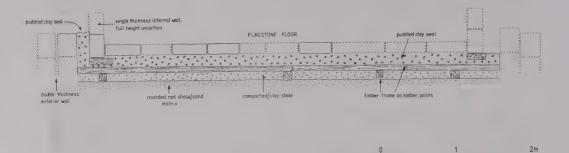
Section looking west across tank no 2, illustrating its method of construction
